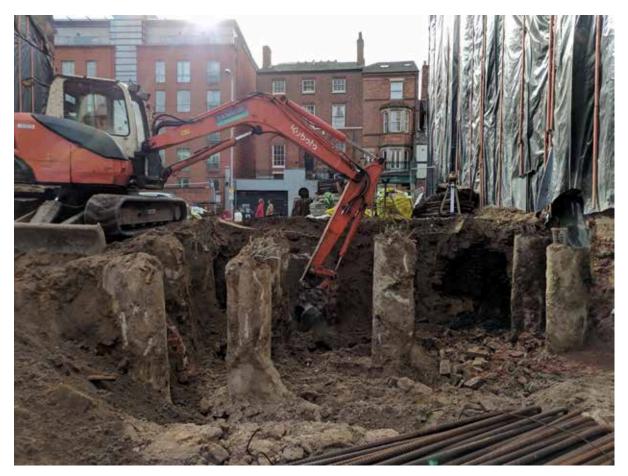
Site visit, facing north towards Derby Road. A partially exposed brick wall can be seen to the west (right) of the machine.
